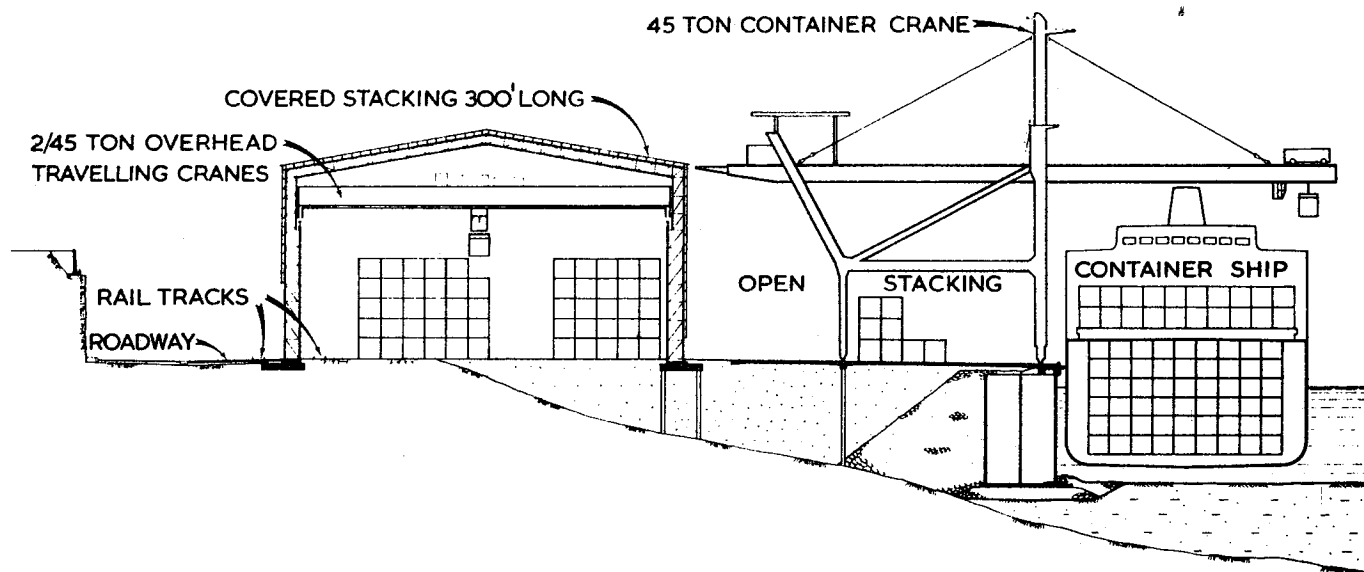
Cross-Section through the Eastern Berth showing a Typical Container Crane and the Multiple-Stacking Principle of Container Storage.
